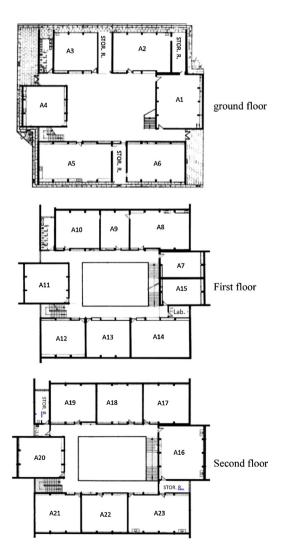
Schematic plan of ground, first and second floor of the case study.
